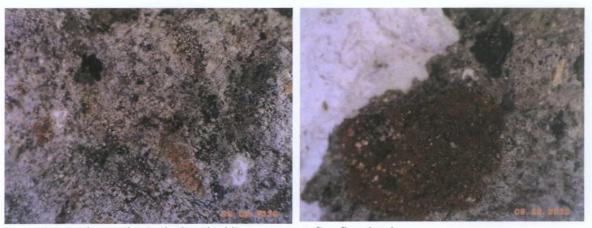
Brick pozzolan in the lime bedding mortars at first floor level.
